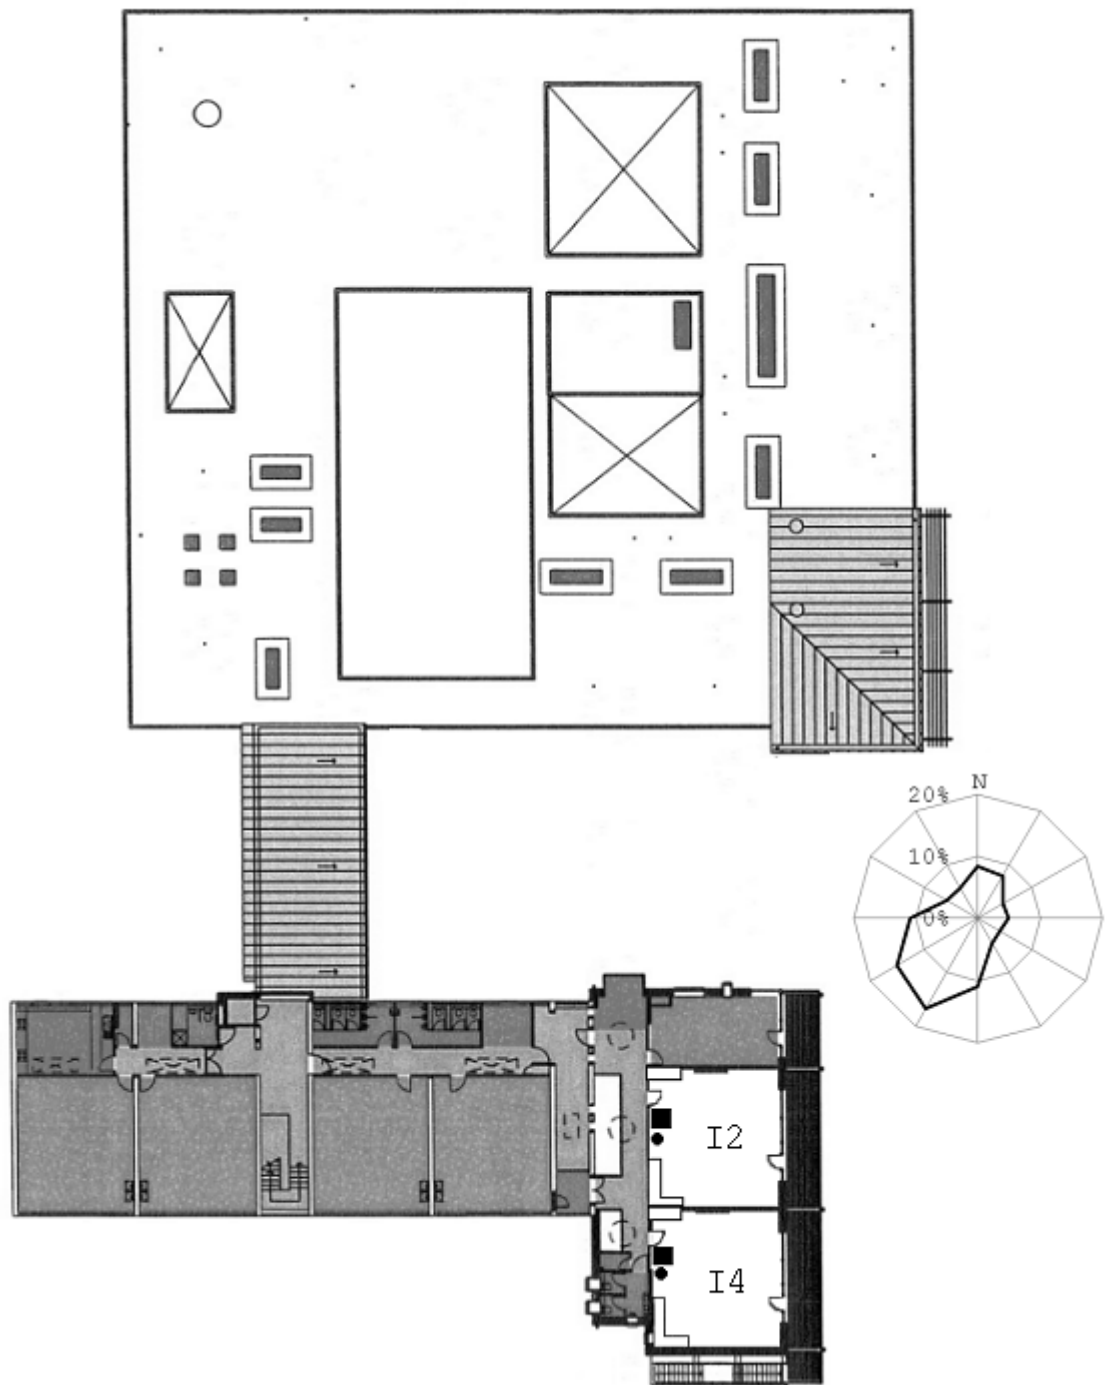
School I, plan view, first floor. I2 and I4, floor area 61.62m².
